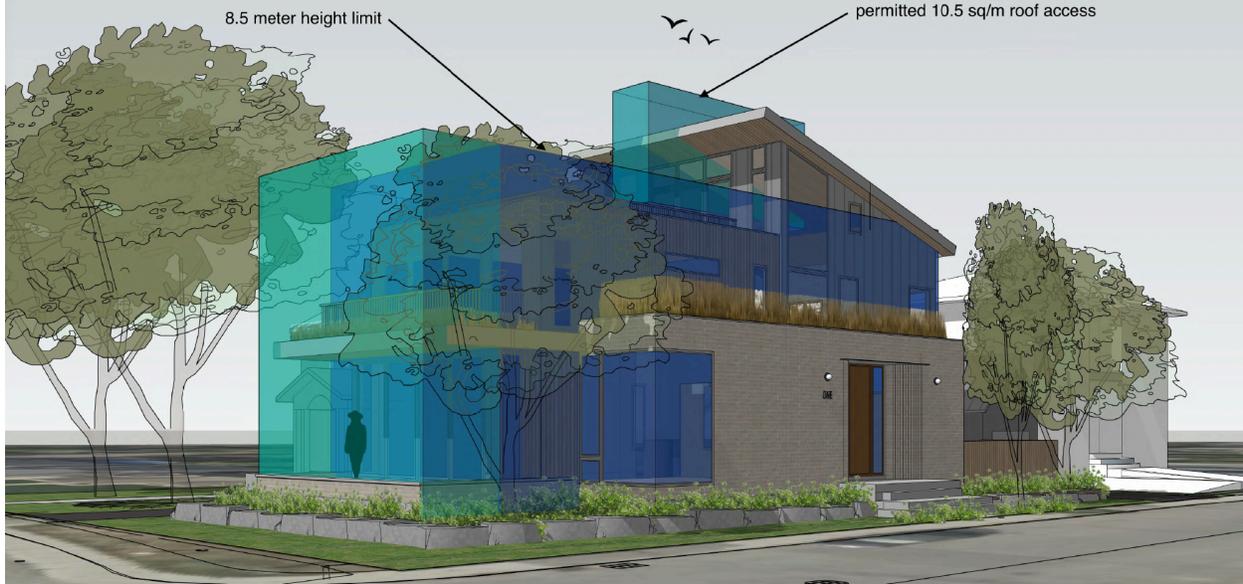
Conceptual Rendering illustrating as of right height in 8.5 m box (blue) as well as the portion of the building elevation that is proposed to be larger than the height limit. (Source: Ardington & Associates)
